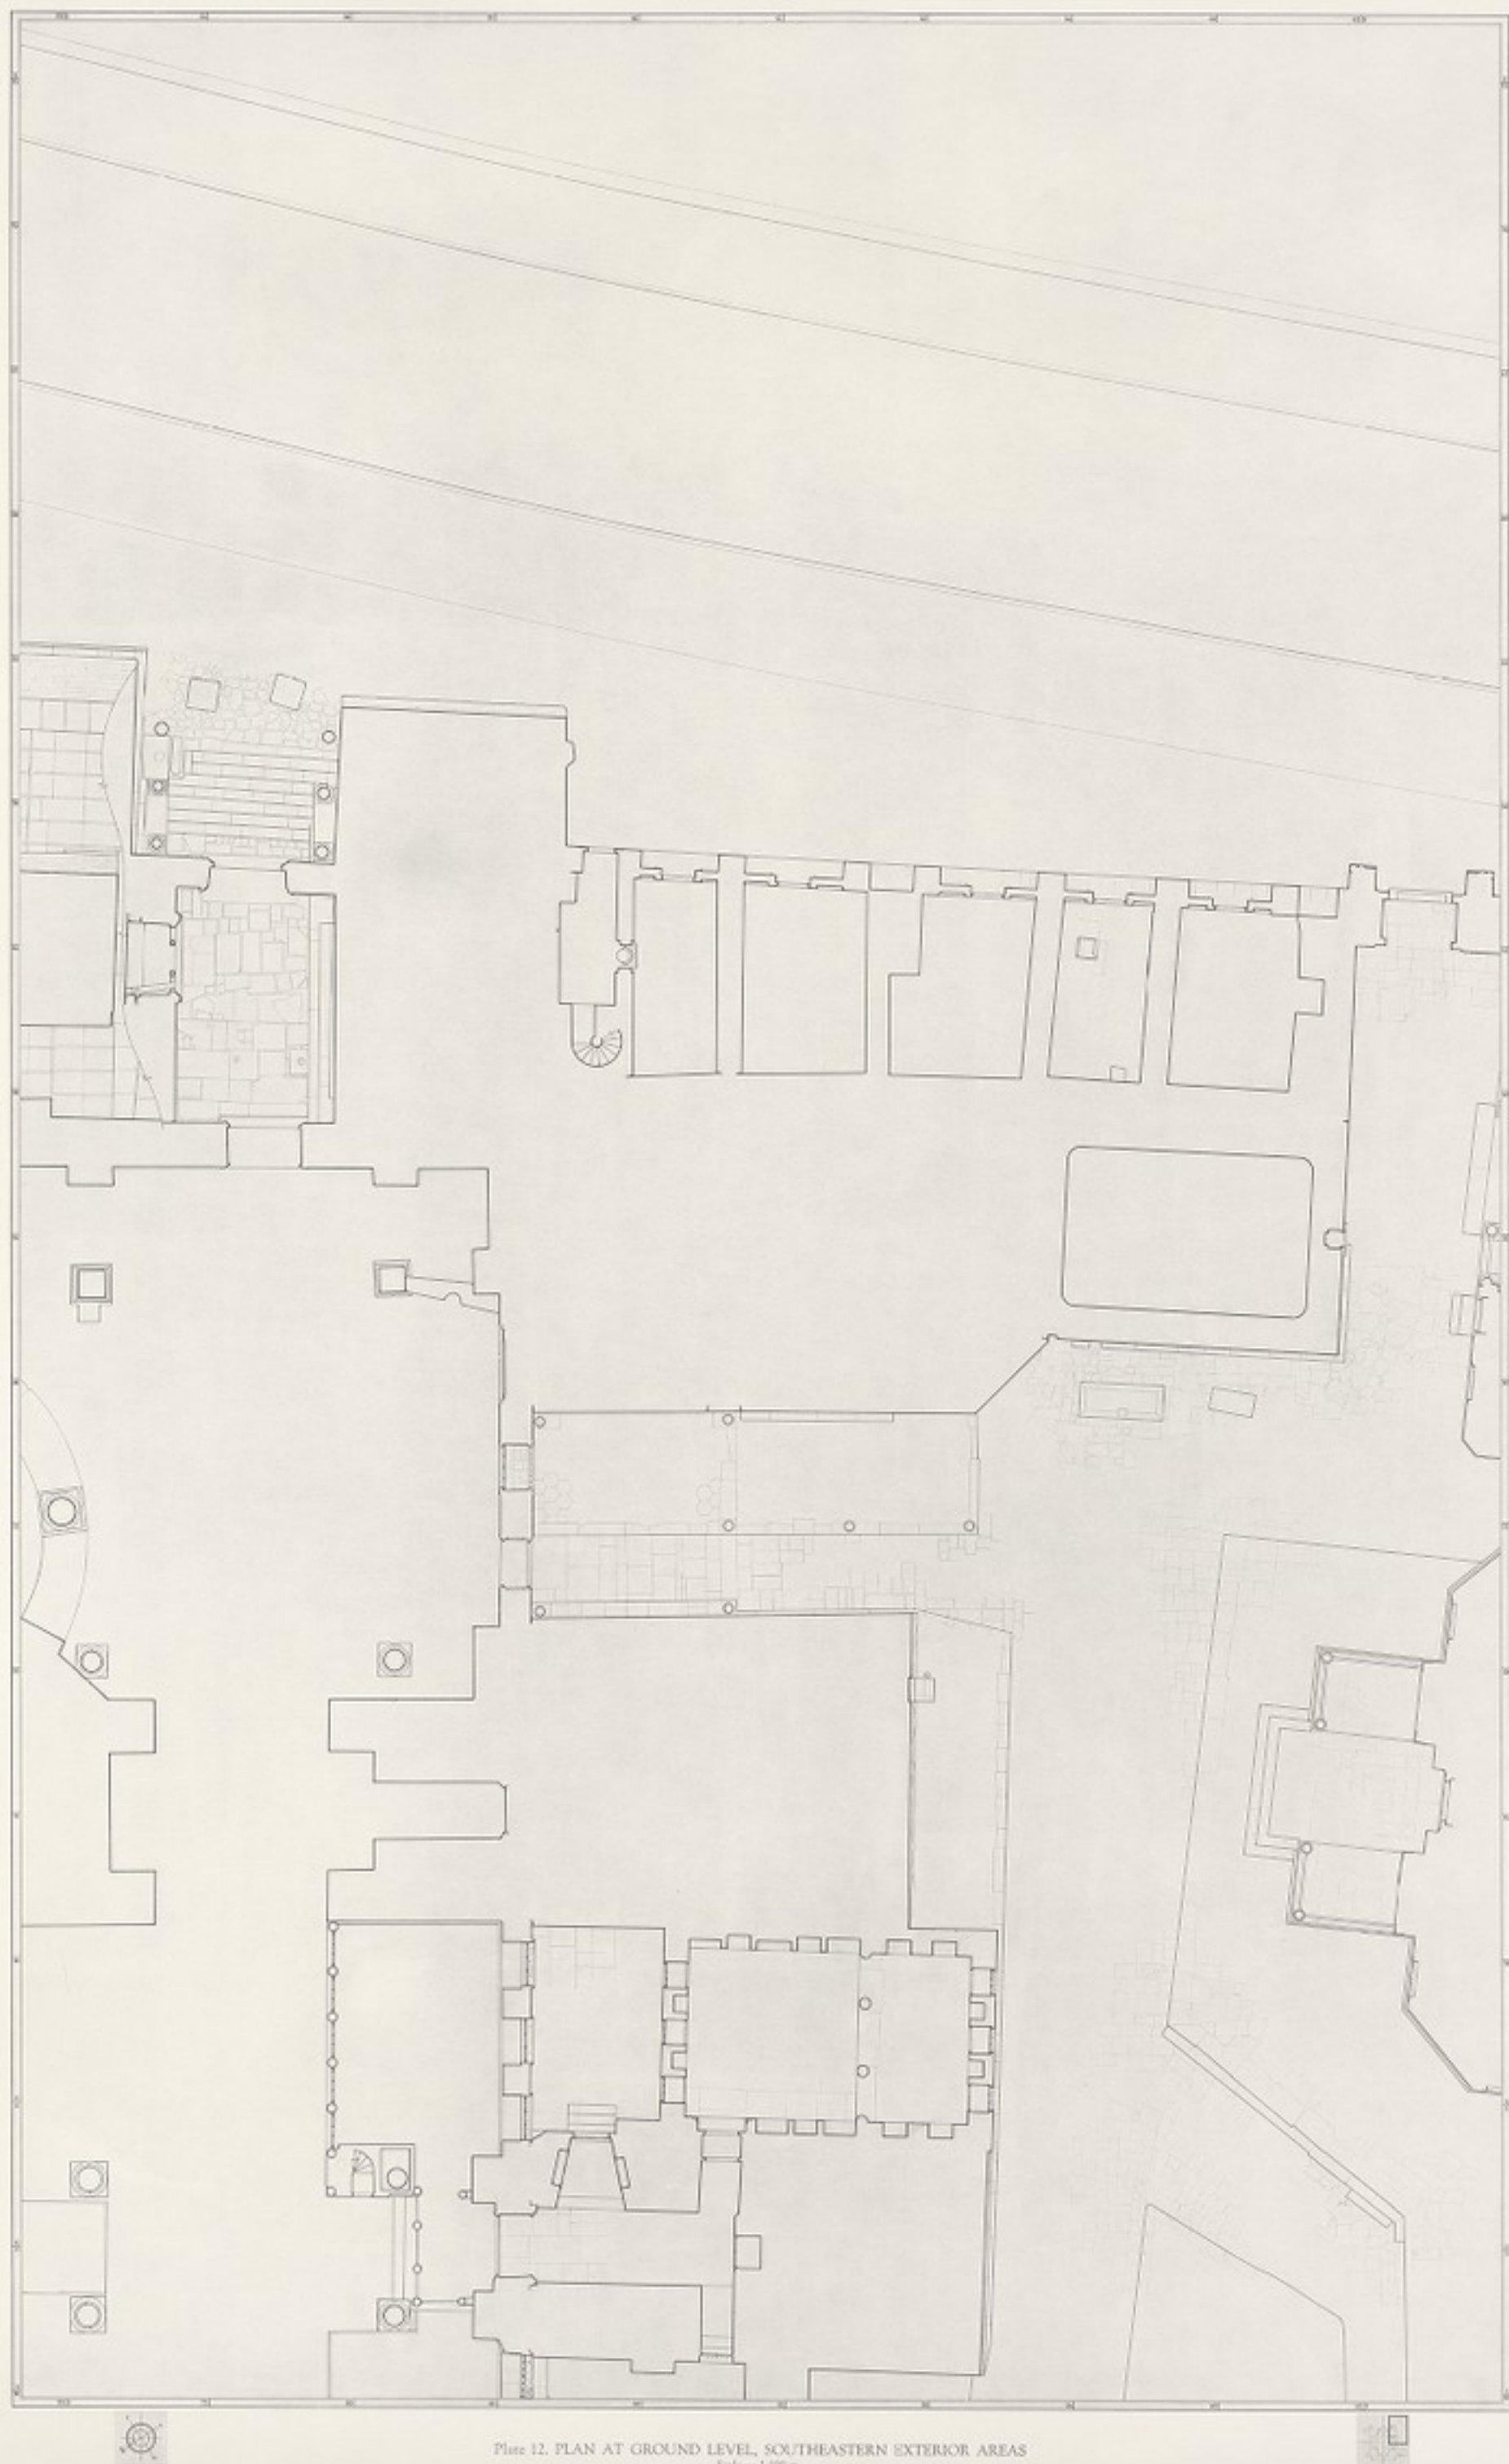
PLAN AT GROUND LEVEL, SOUTHEASTERN EXTERIOR AREAS
